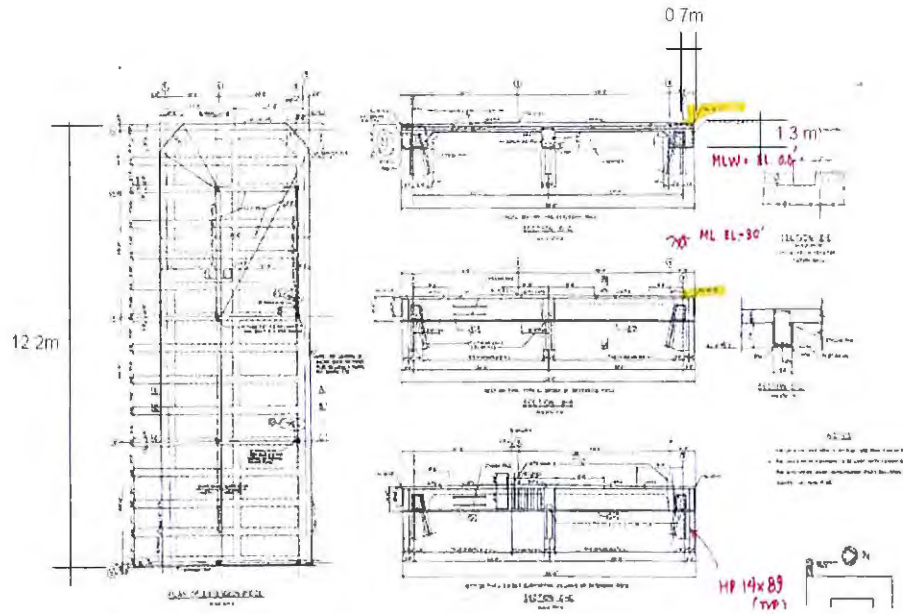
Pier 40 Finger Pier Extension Structure Cross Section
